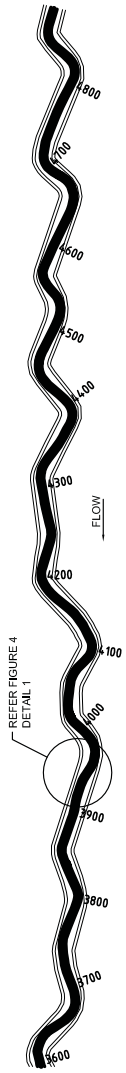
PROPOSED EASTERN CREEK PLAN
